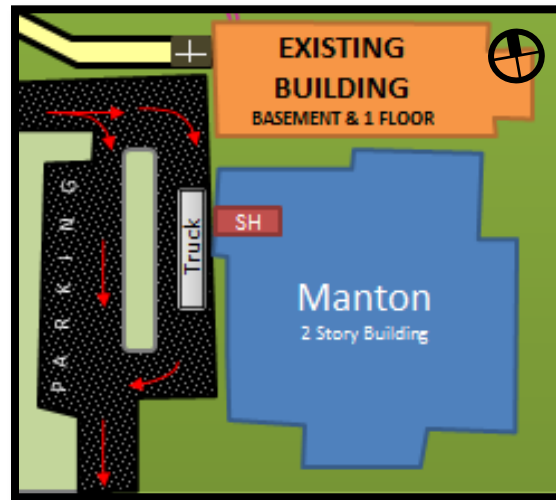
is a snap shot of the full logistics plan in Appendix C that shows the PV panels delivery trucks.
